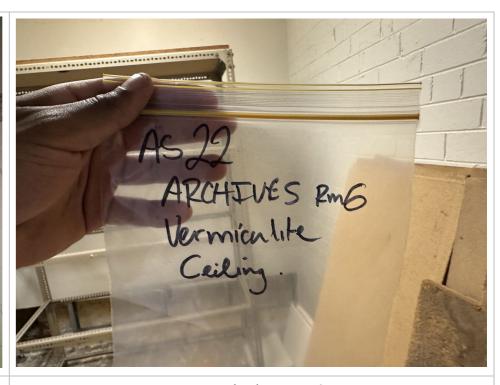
DKB – Sample 22 (S22): Sample of vermiculite ceiling
